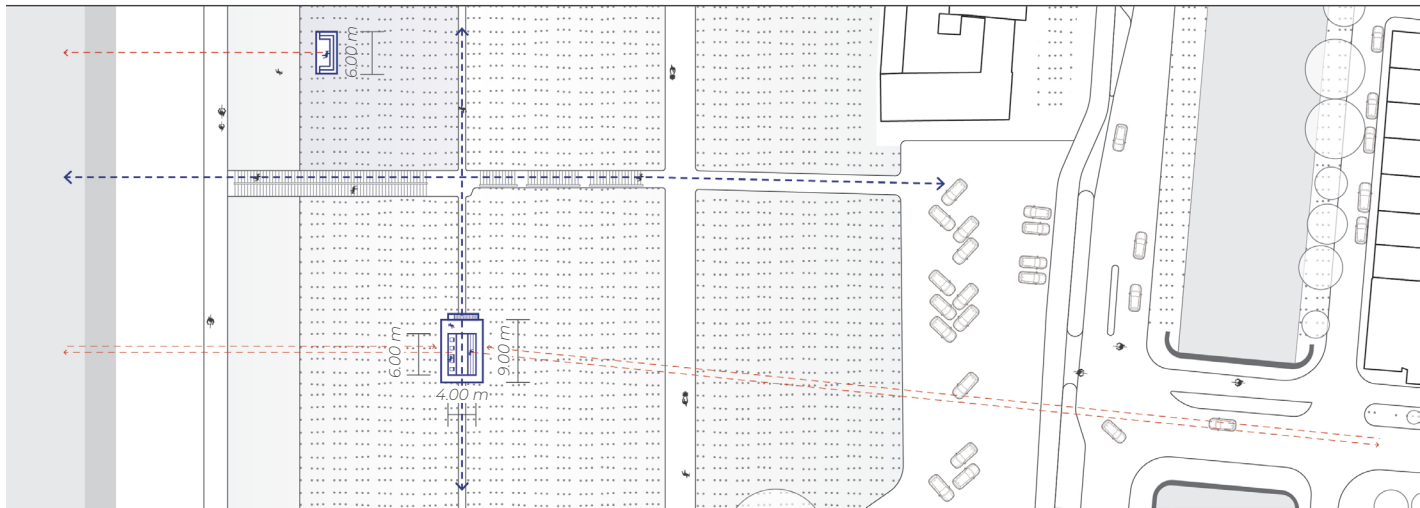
A road cross-sections of the road A after intervention, which shows a new benchtower on the dike and a new embedded bench shelter in the dike as view frames and a new city landmark to enhance the south-north city axis.
